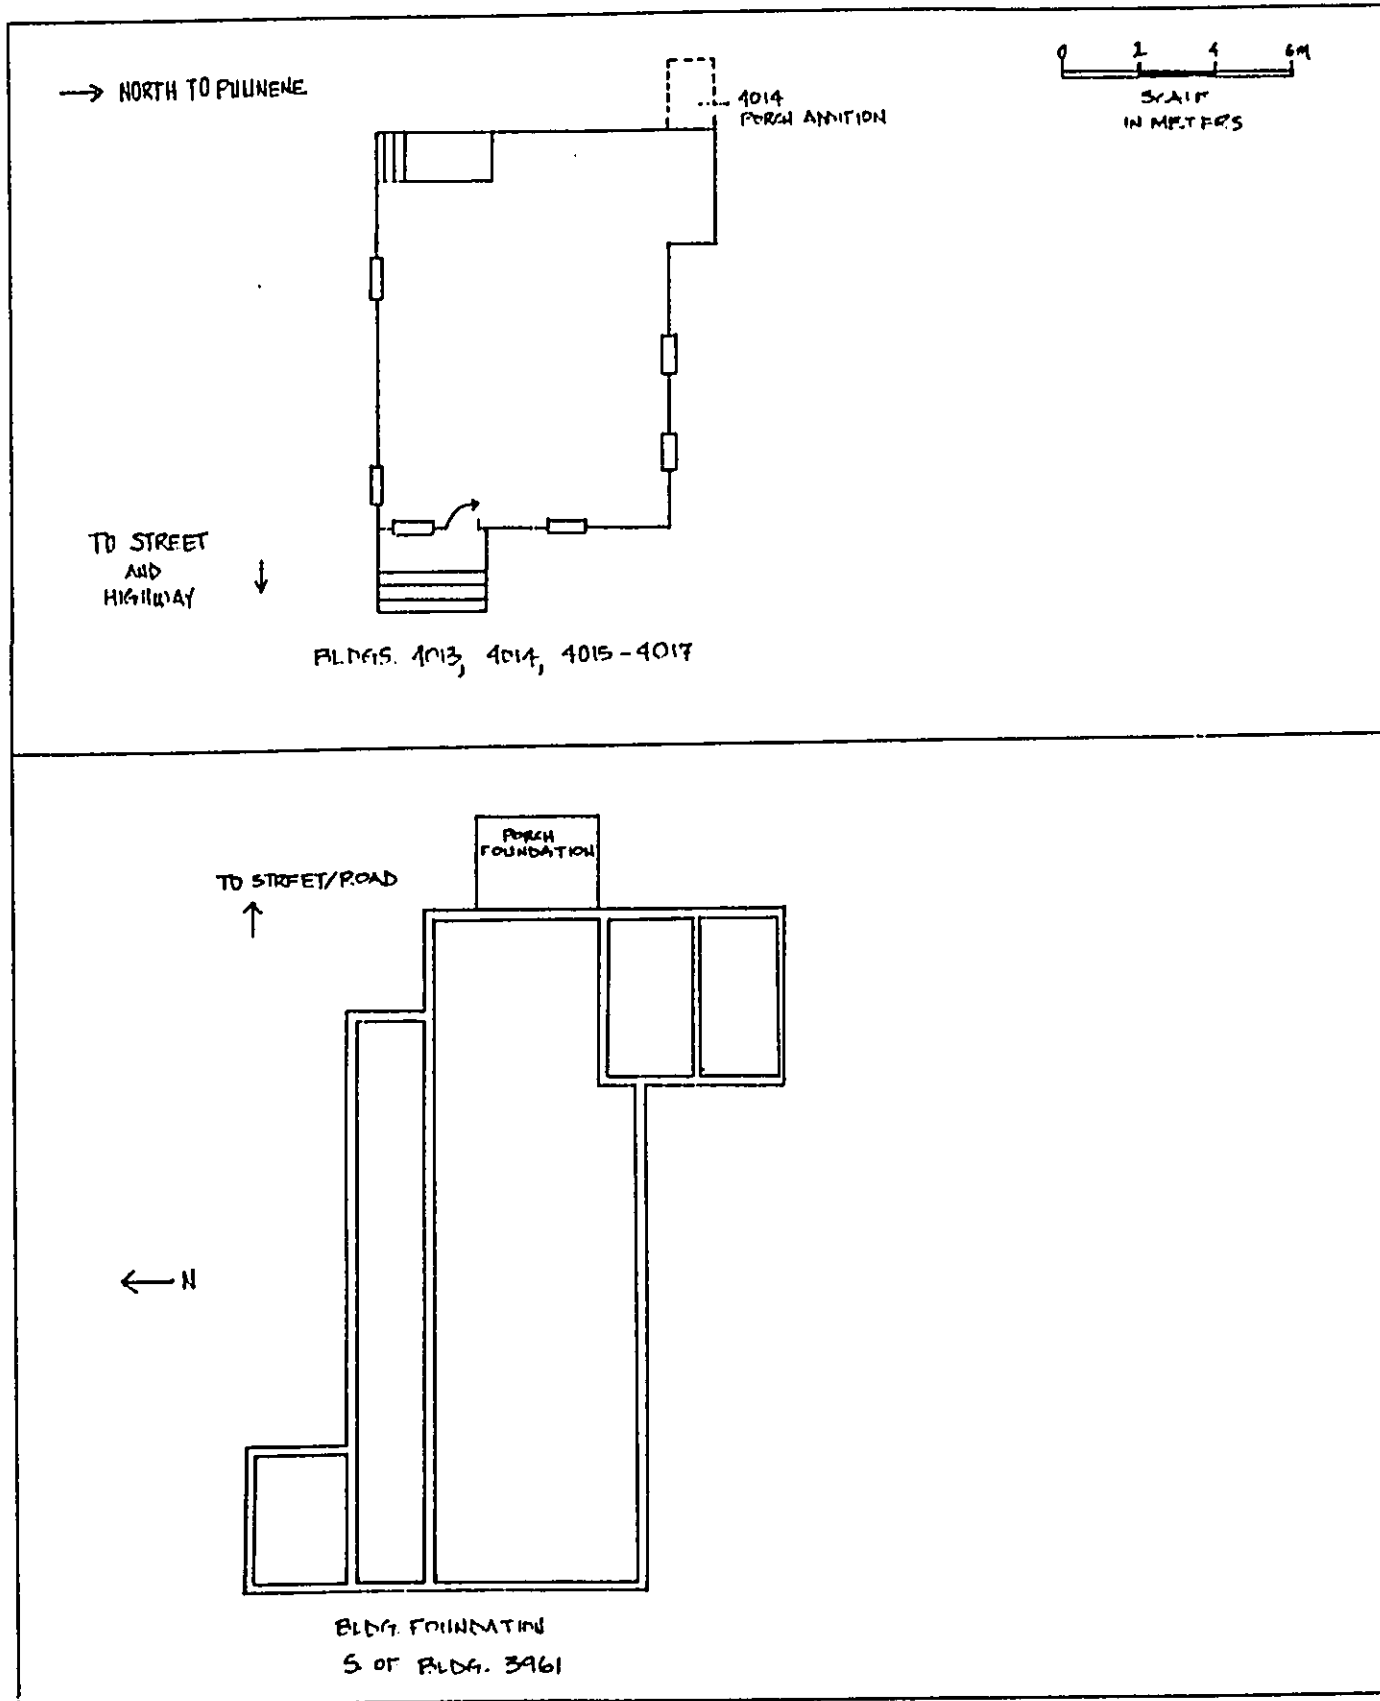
McGERROW VILLAGE HOUSE FOOTPRINTS FOR BUILDING NOS. 4013, 4014, 4015 TO 4017 AND BUILDING FOUNDATION SOUTH OF BLDG. NO. 3961.
